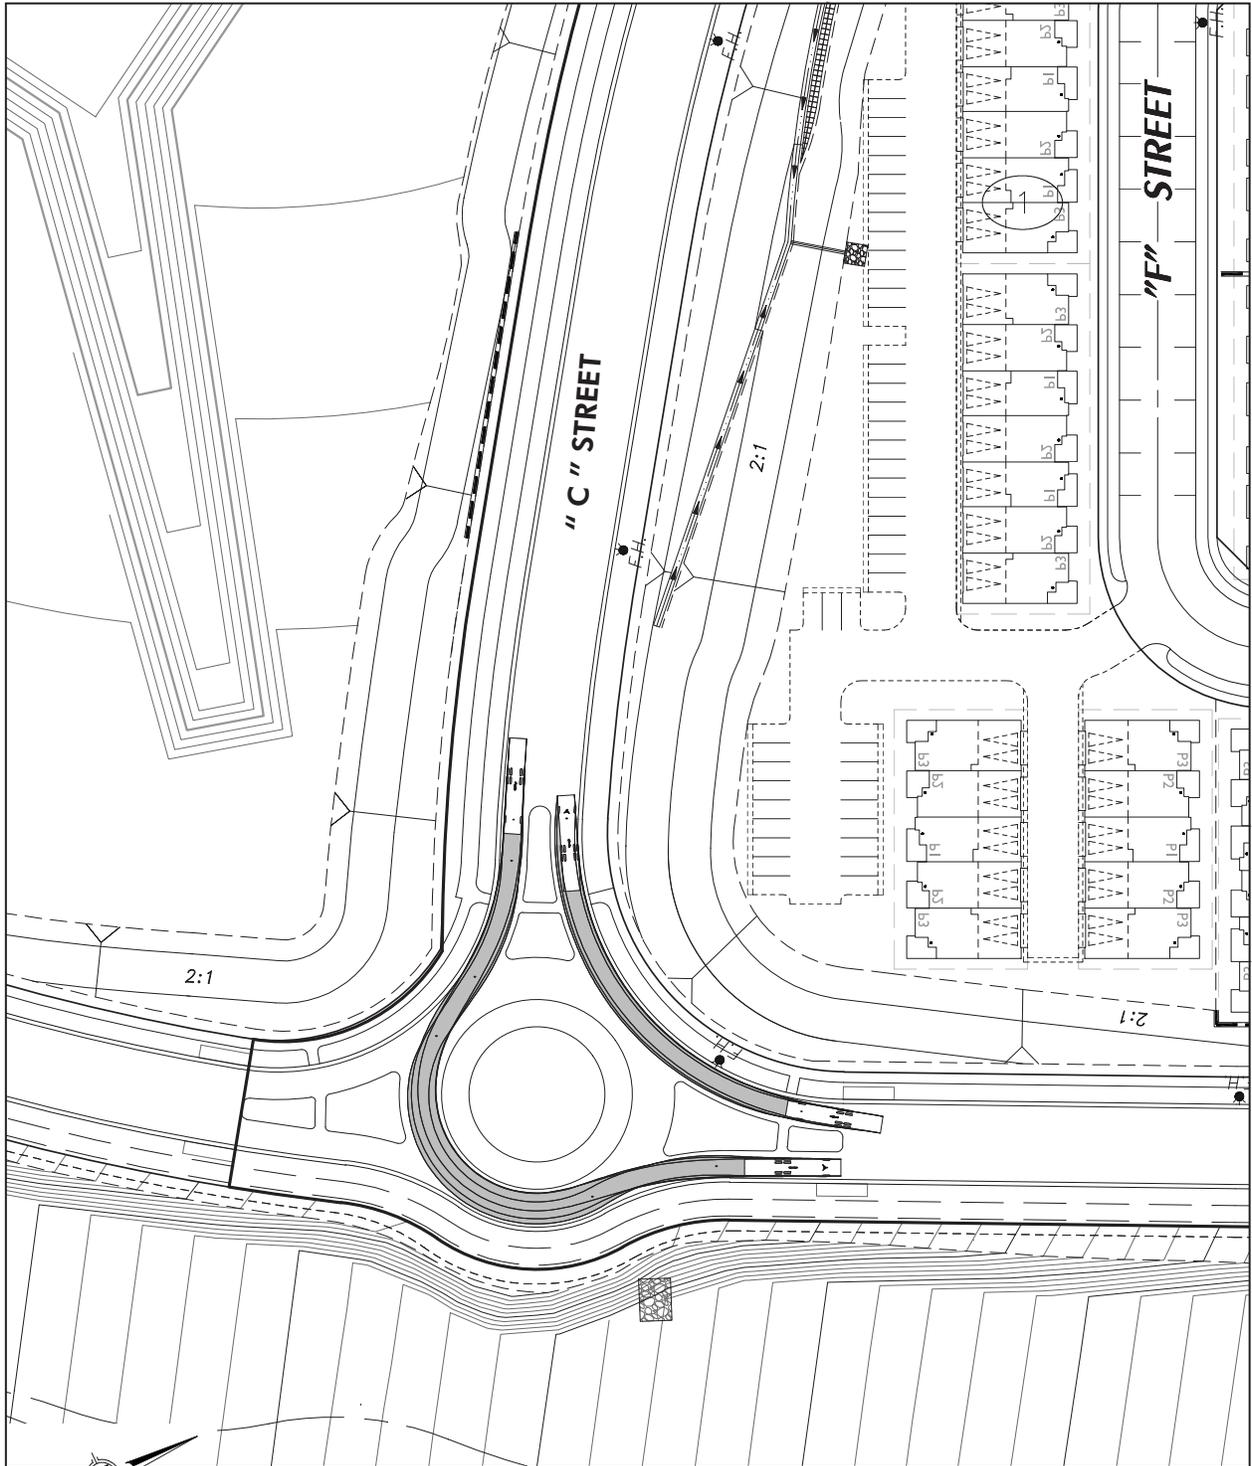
, Streets C - Conceptual Roundabout Layout (Typical)
